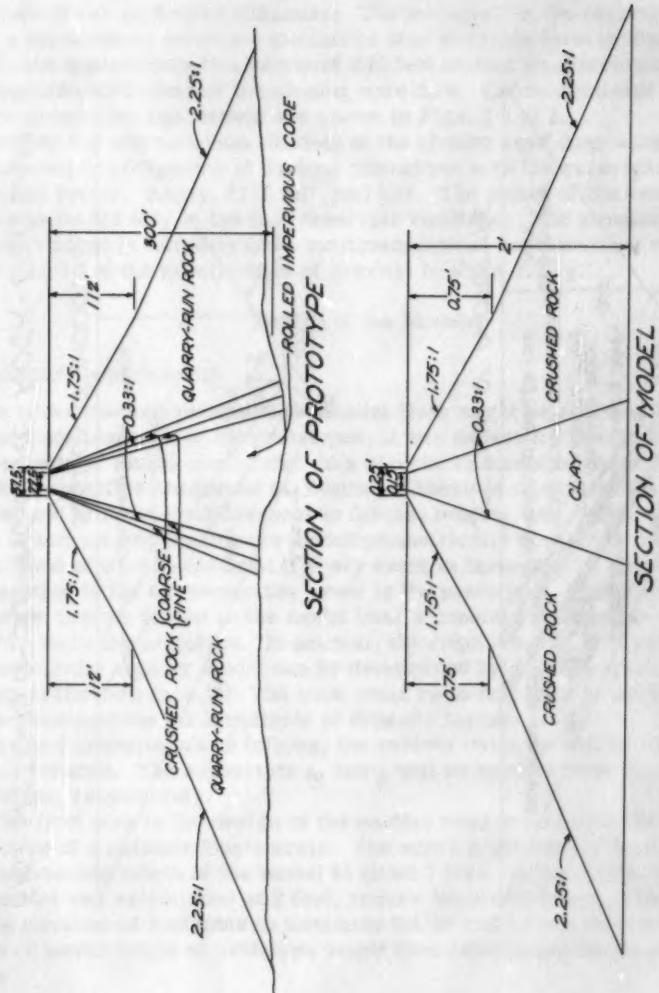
SECTIONS OF CENTER-CORE ROCK-FILL DAM
